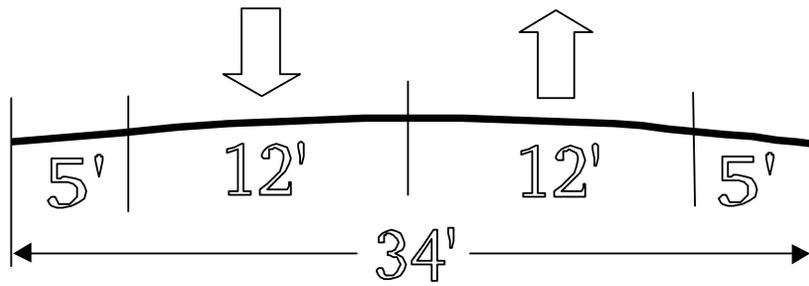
, Estero Boulevard cross-section with 5-foot paved shoulders
